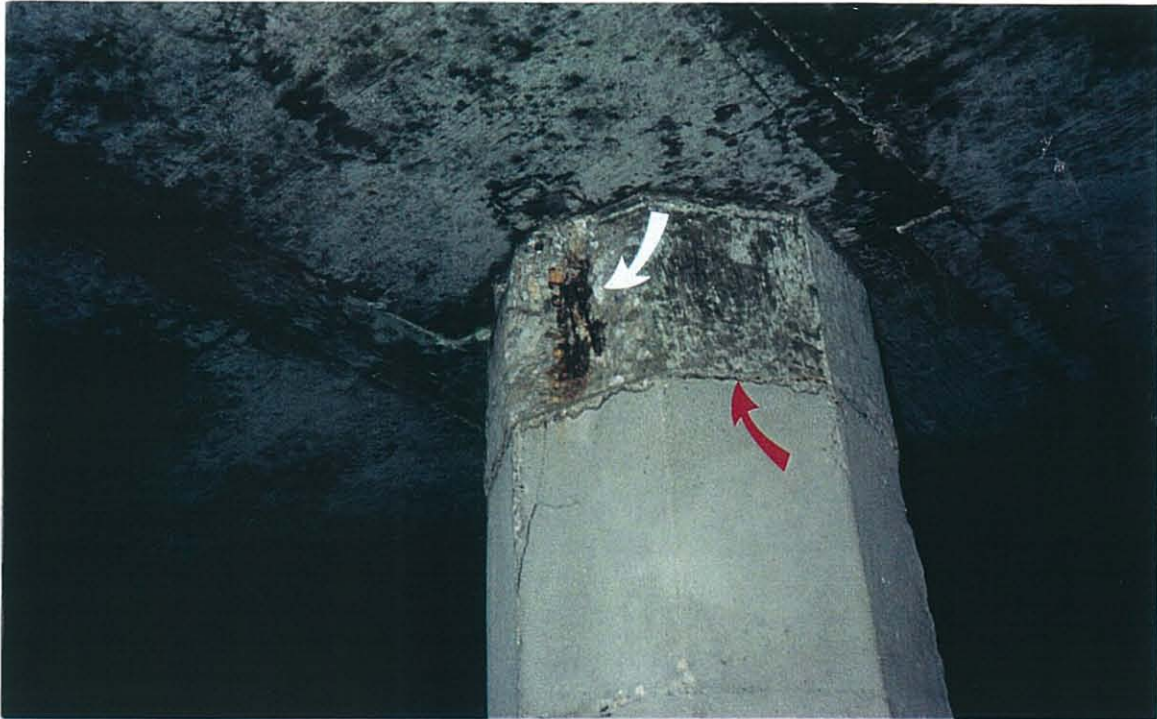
Built-up cast-in-place (CIP) section on concrete pile. Red arrow indicates typical crack location, while white arrow points to corrosion spall at CIP section.
